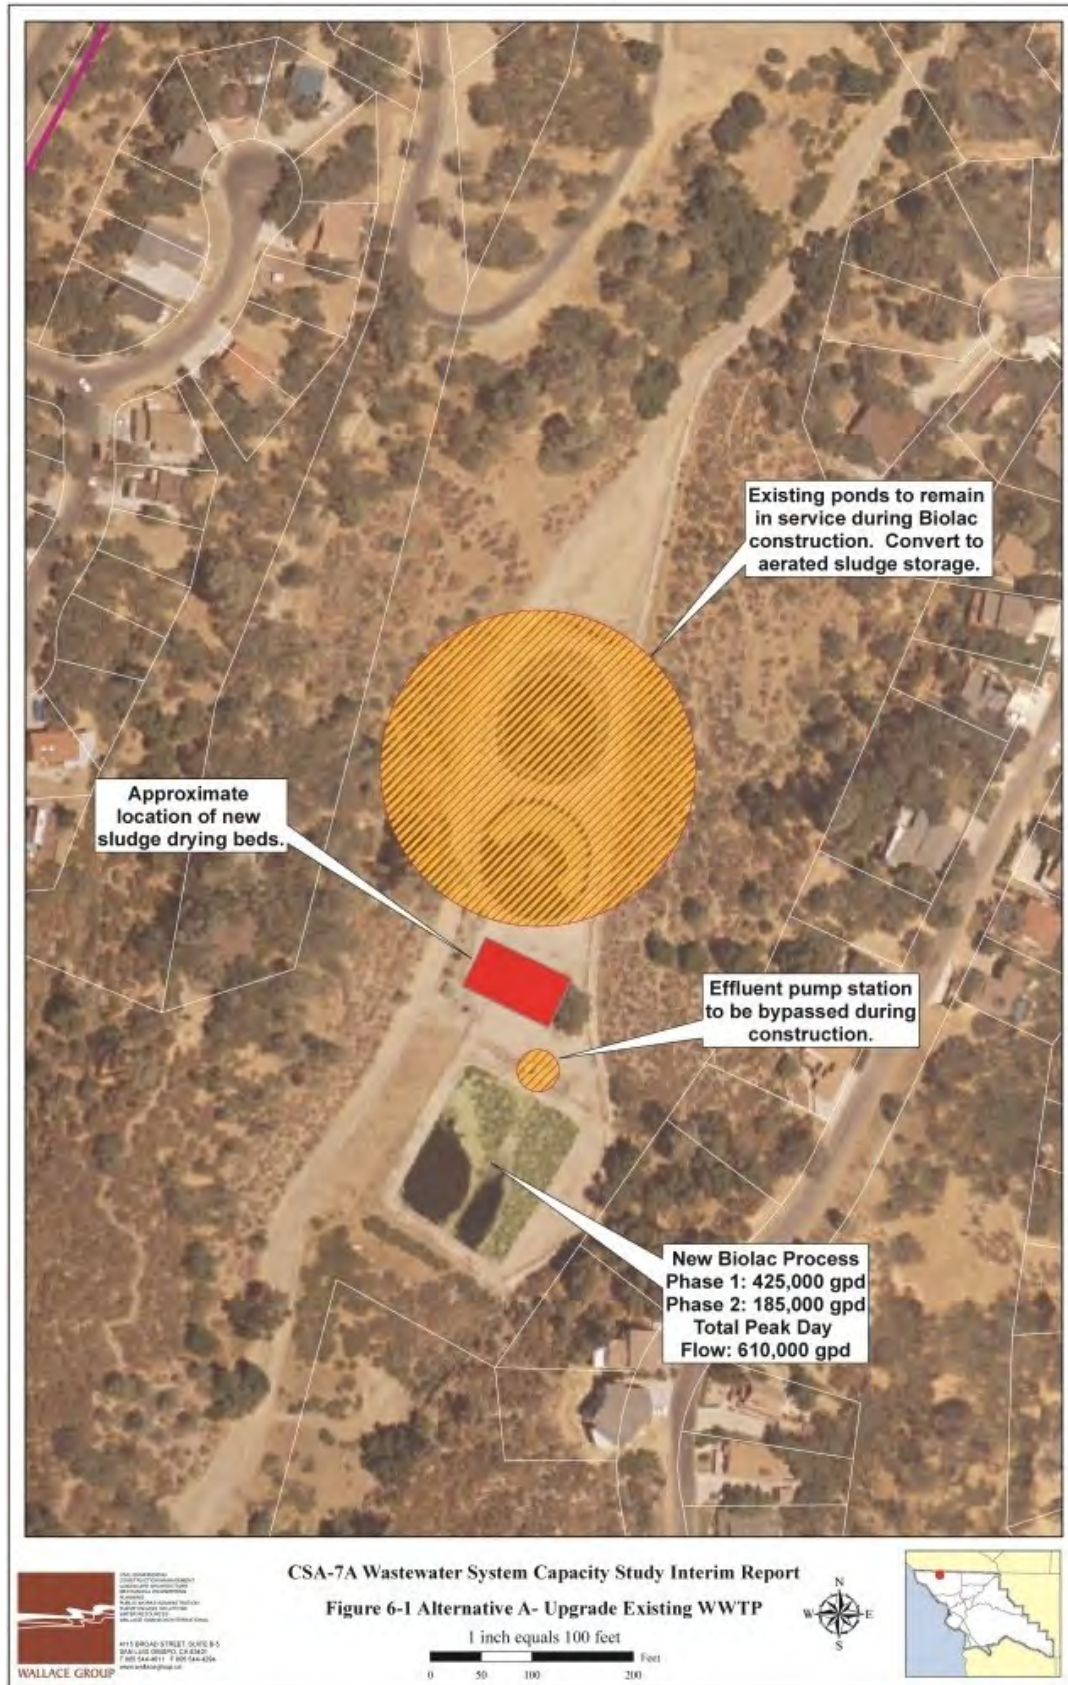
Proposed sludge drying beds at the wastewater treatment facility.
